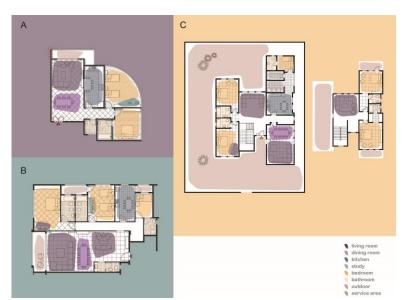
Three different plans considered: plan A in Deira and Bur Dubai (1), plan B in Dubai Marina and JBR (3); plan C in Dubai Silicon Oasis Centre (5)
